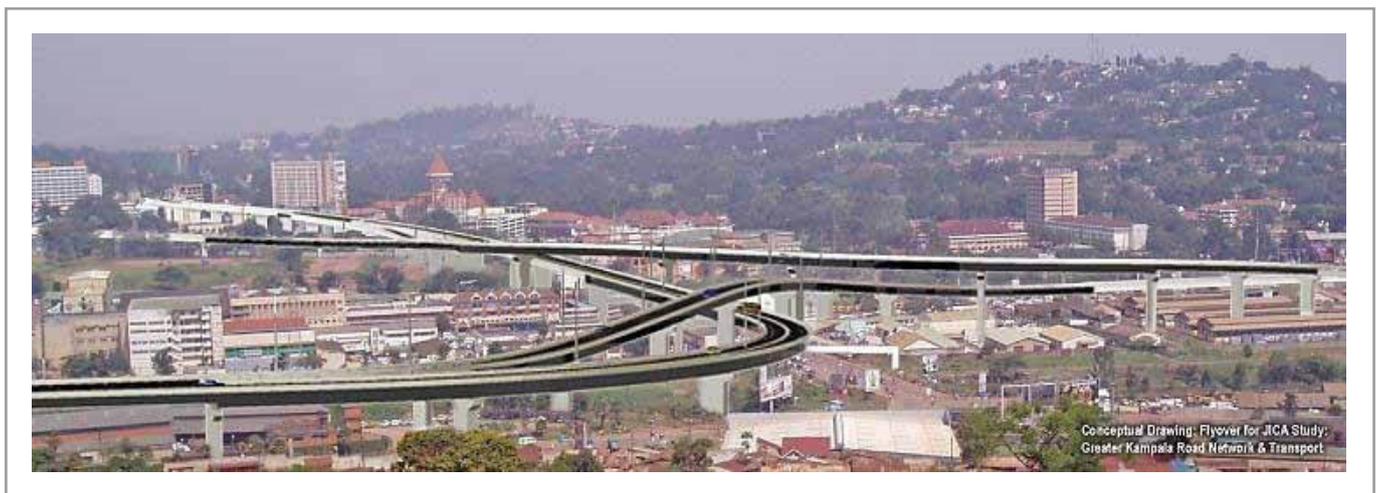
Conceptual Drawing Flyover Clock Tower to Jinja road and Yusuf Lule road
